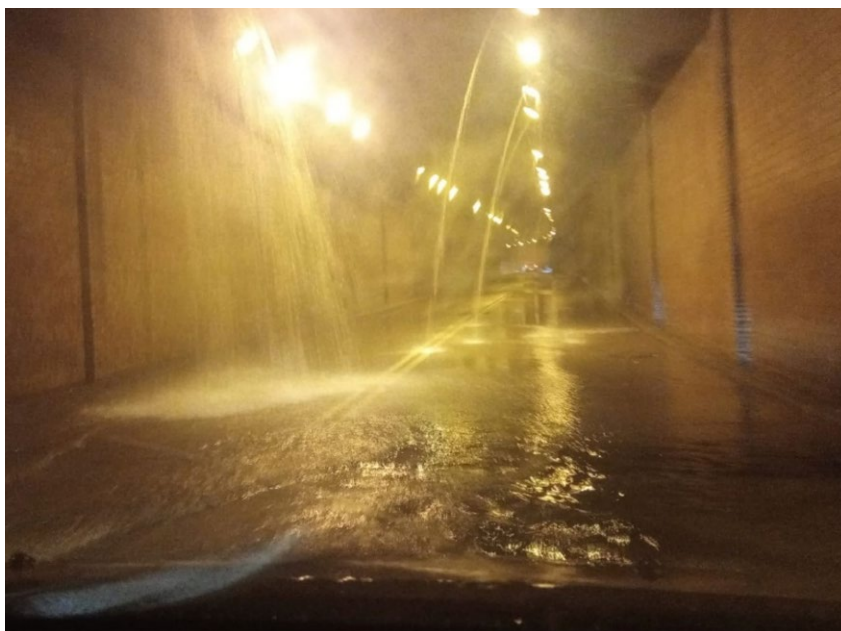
Ponding in the tunnel of Calle Burgos, Santander
